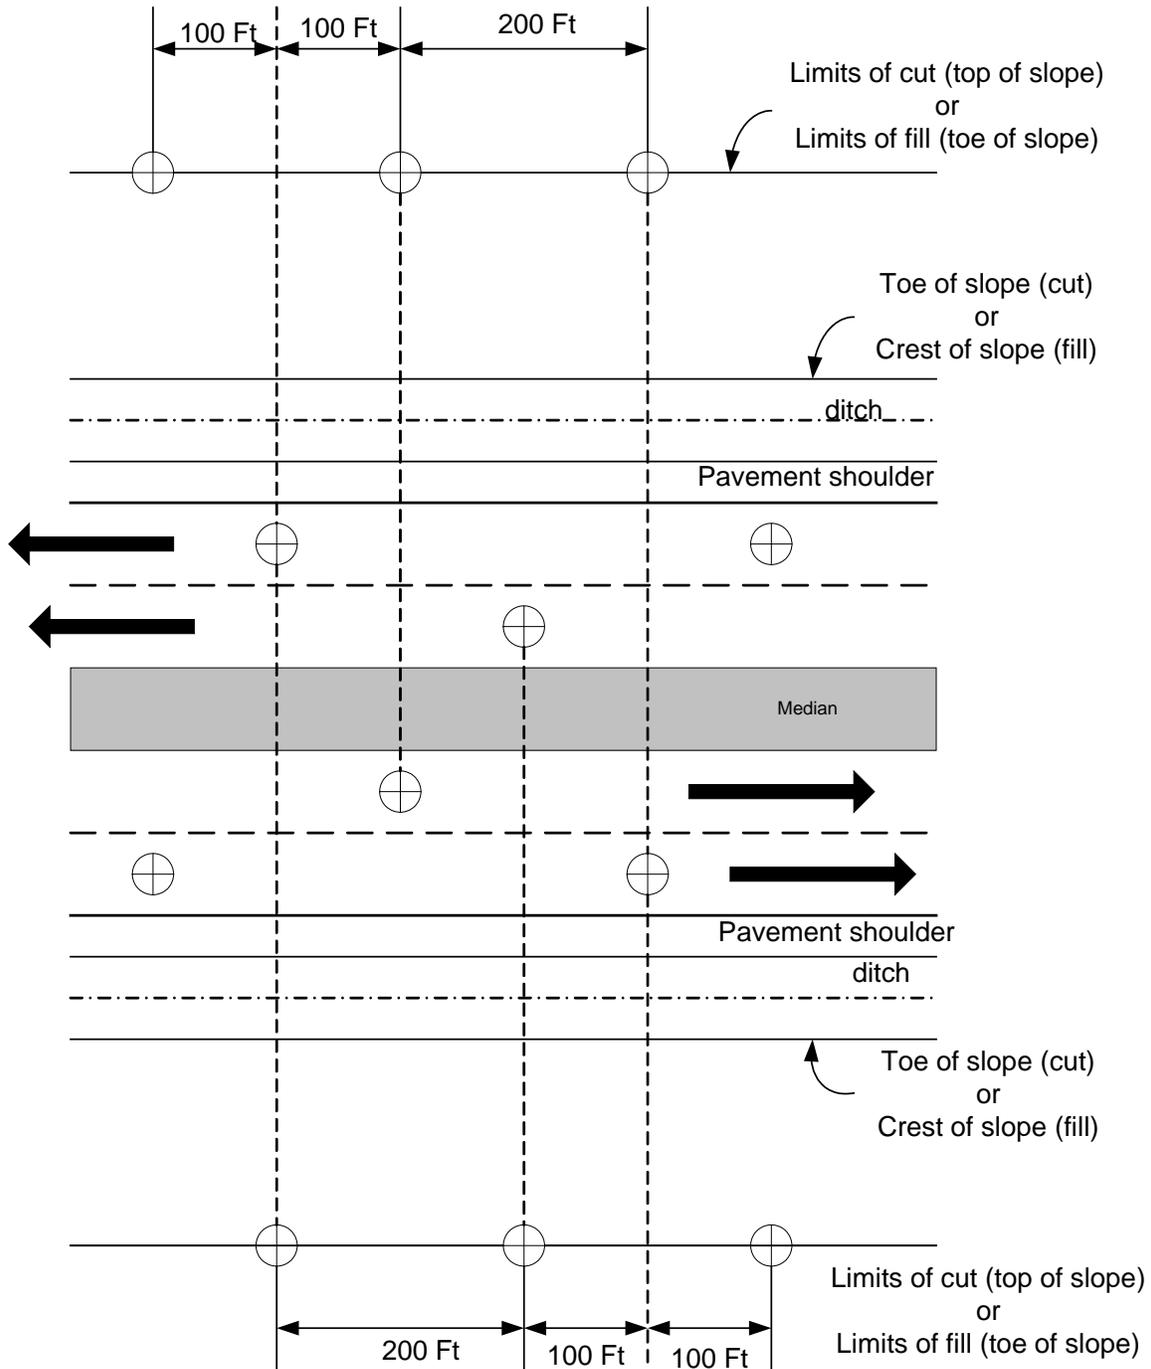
EXPLORATION LAYOUT FOR A FOUR (4) LANE DIVIDED ROAD WITH CUT OR FILL SLOPES EQUAL TO OR GREATER THAN 25 FT HIGH OR AREAS WHERE ROCK EXCAVATION IS EXPECTED TO BE ENCOUNTERED ABOVE THE PLANNED DEPTHS OF EXCAVATION
